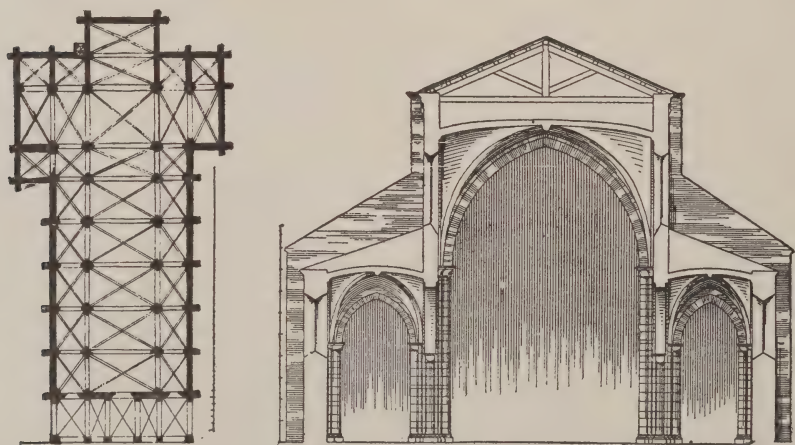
Chiaravalle di Castagnola. Plan and Section.
